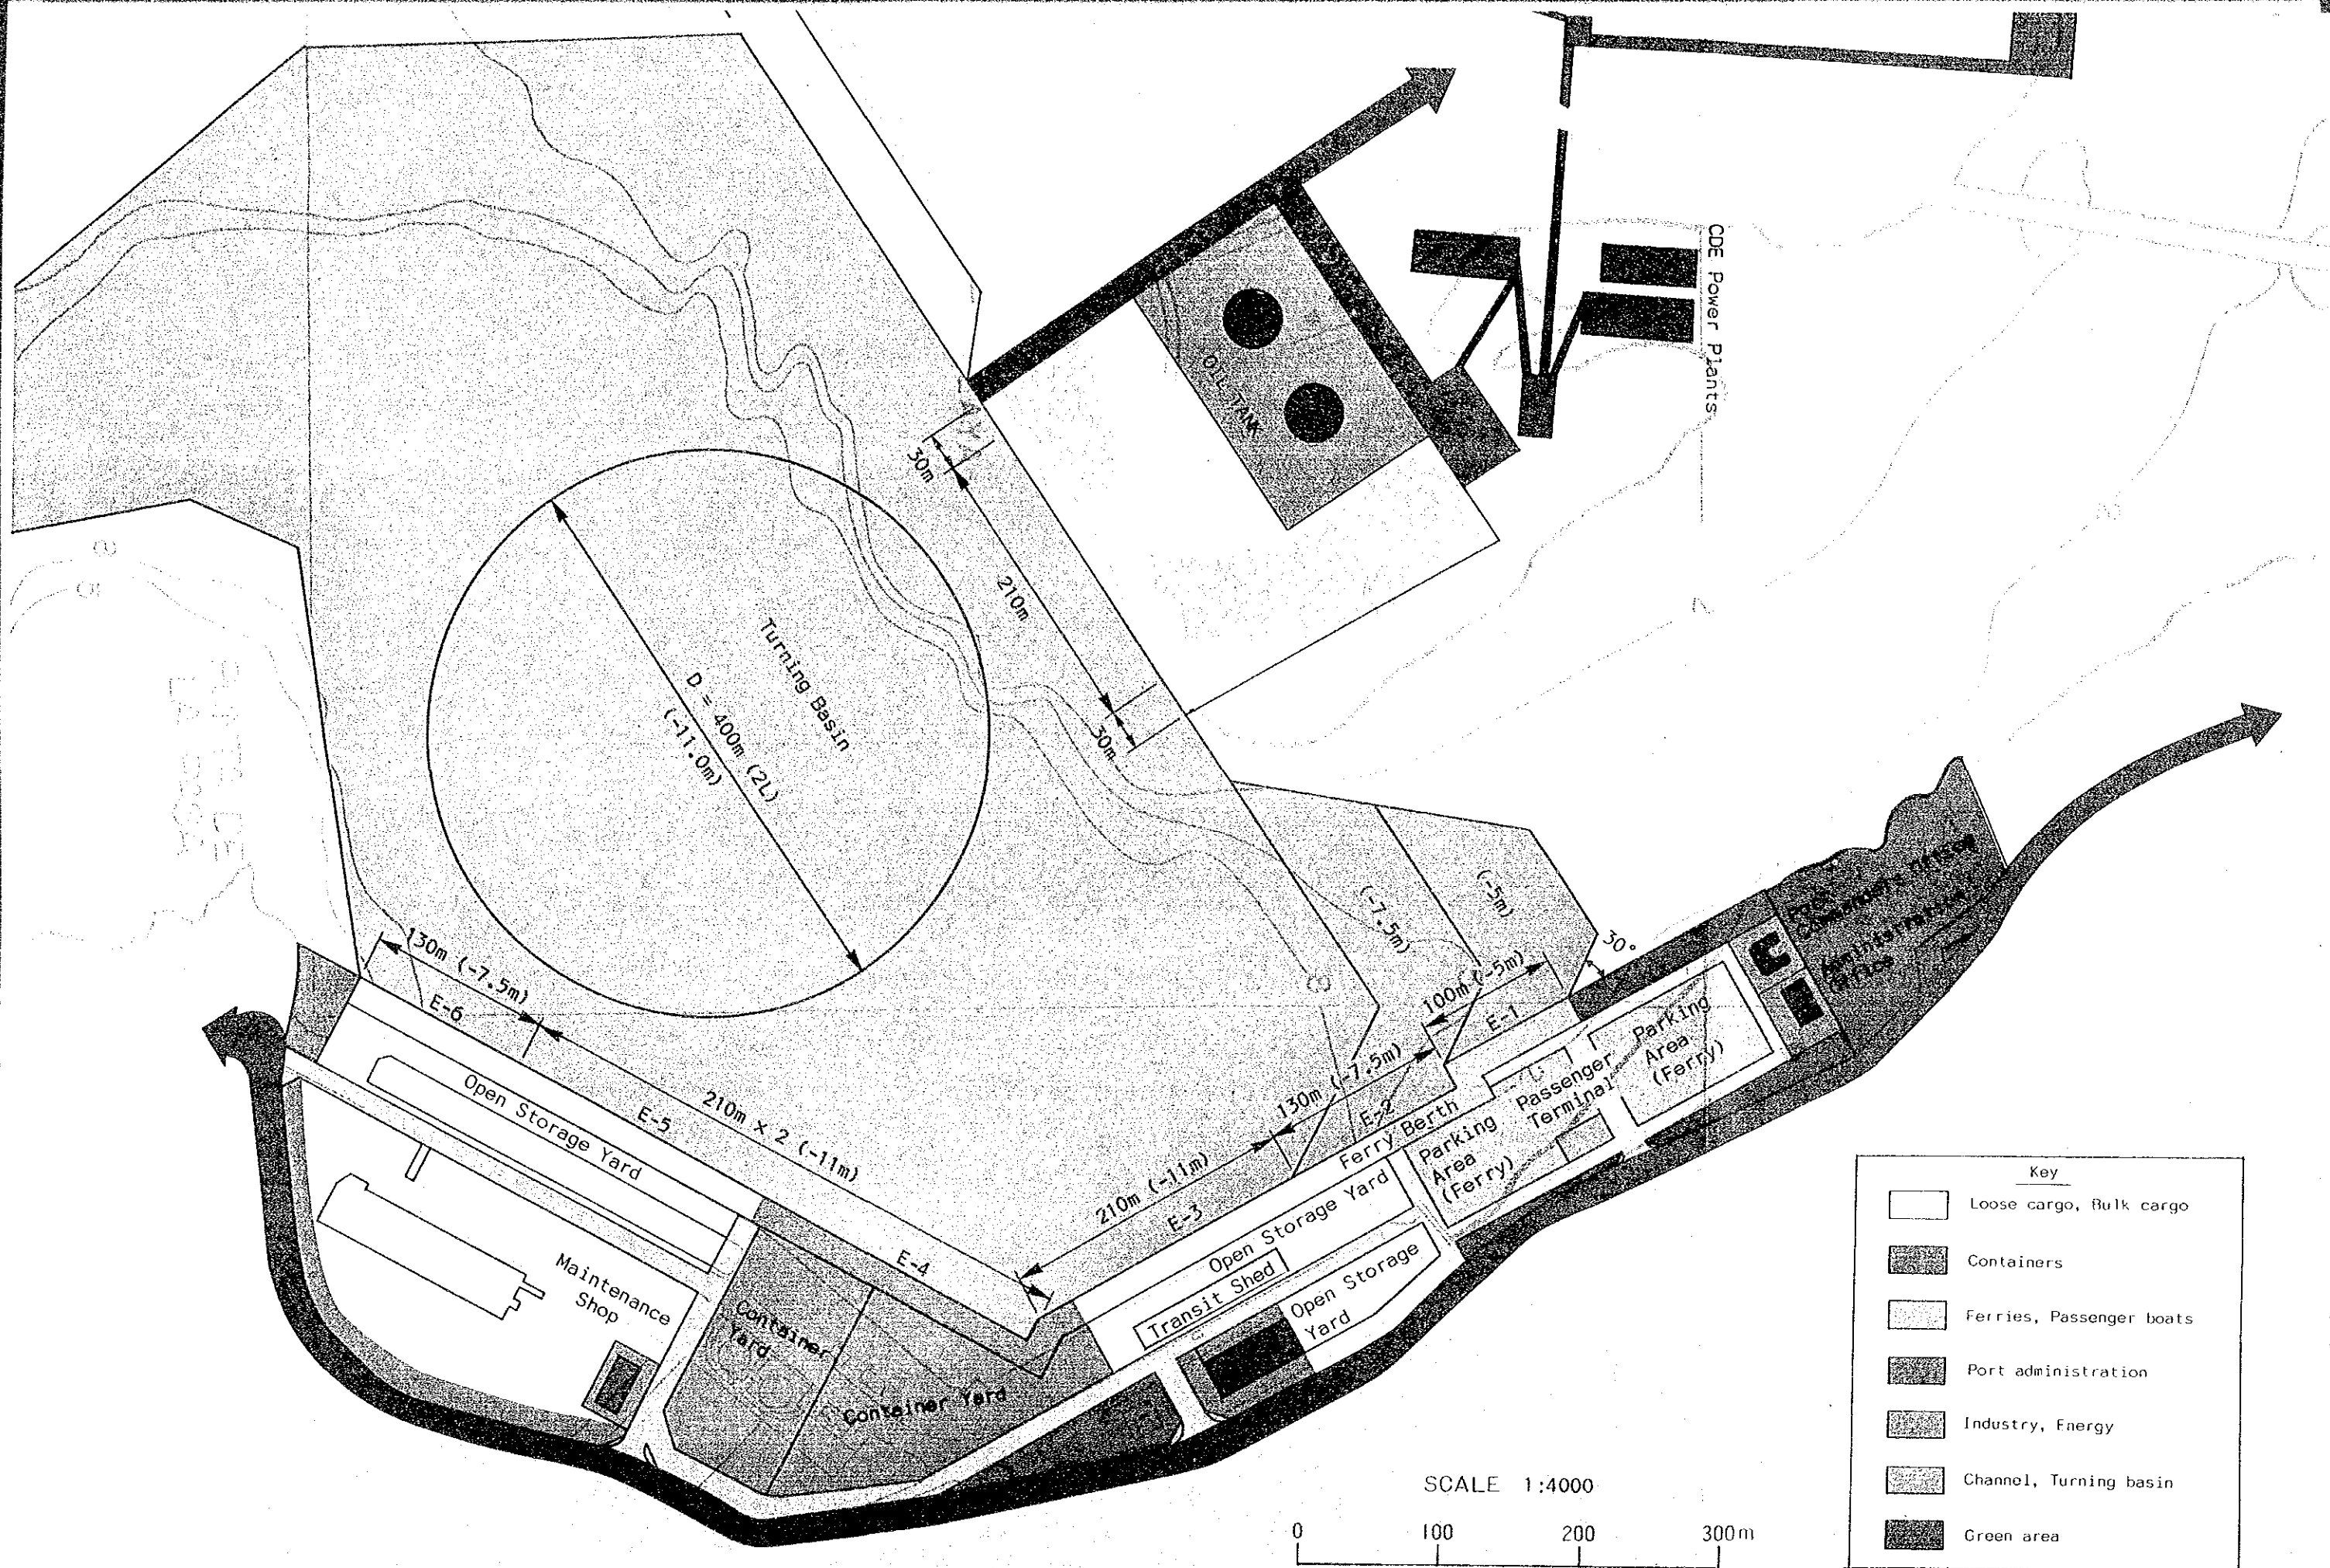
Layout of Port Facilities for the Master Plan
